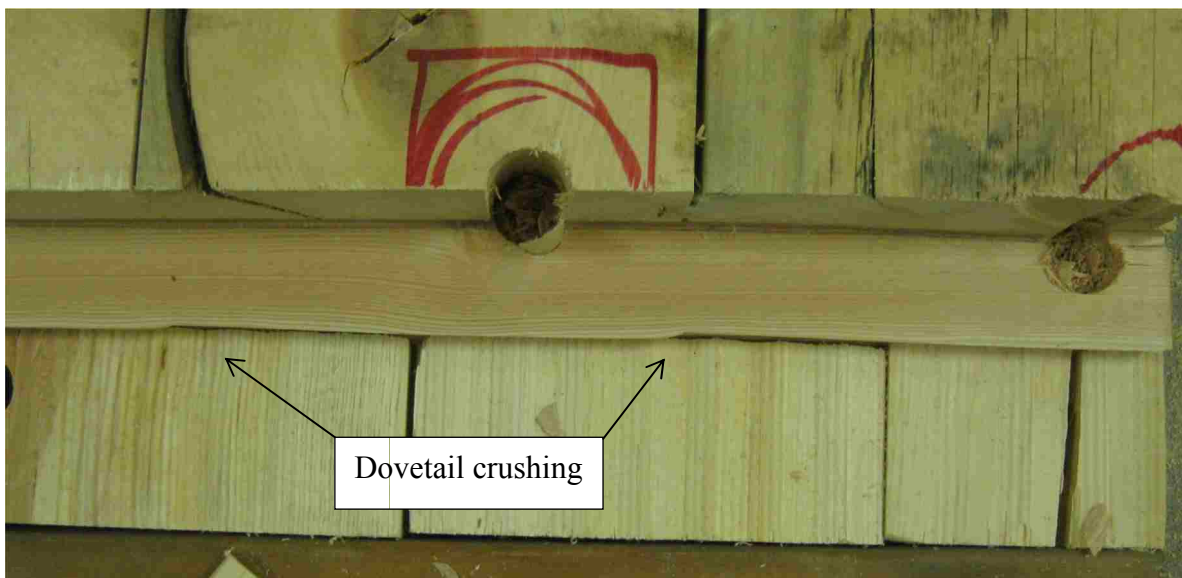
Dovetail Indentations from Rotating Vertical Members (Wall 3)
